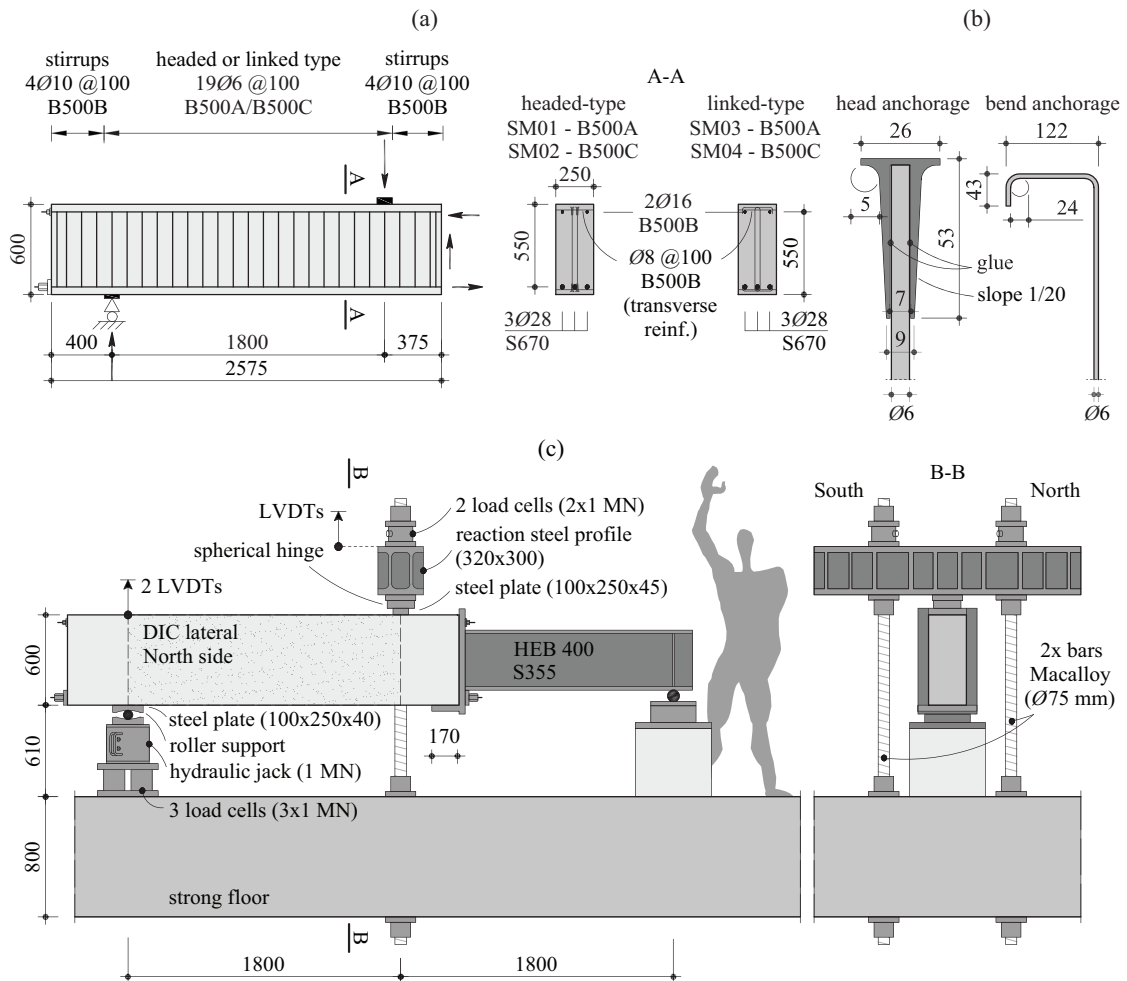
Series SM00: (a) geometry of specimens with reinforcement layouts; (b) shear anchorage detail; and (c) test set-up.
